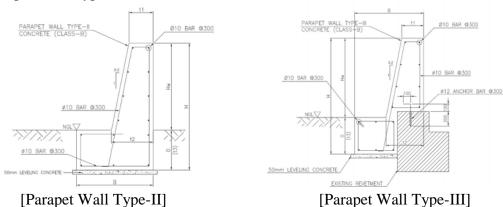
Typical Cross Section of Parapet Wall Type-II, III
